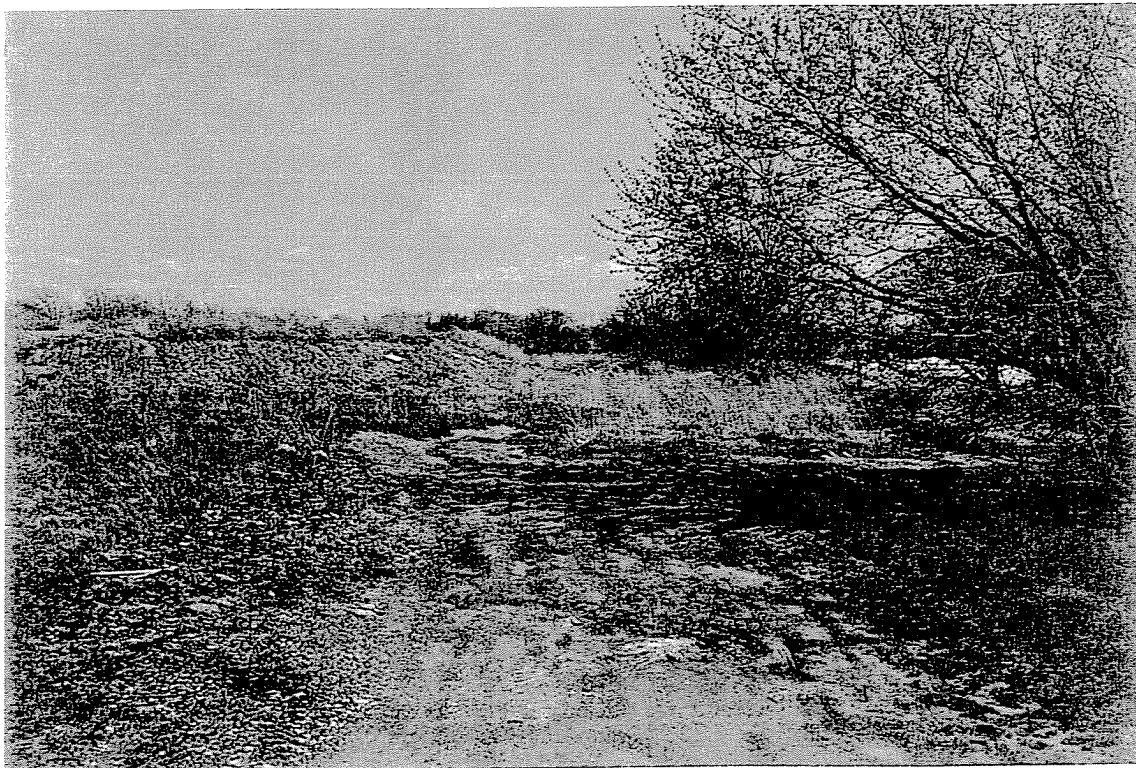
Shore area and high fill area in the eastern section of the project area facing southeast from the eastern park access road and the dirt road to the high fill area.
